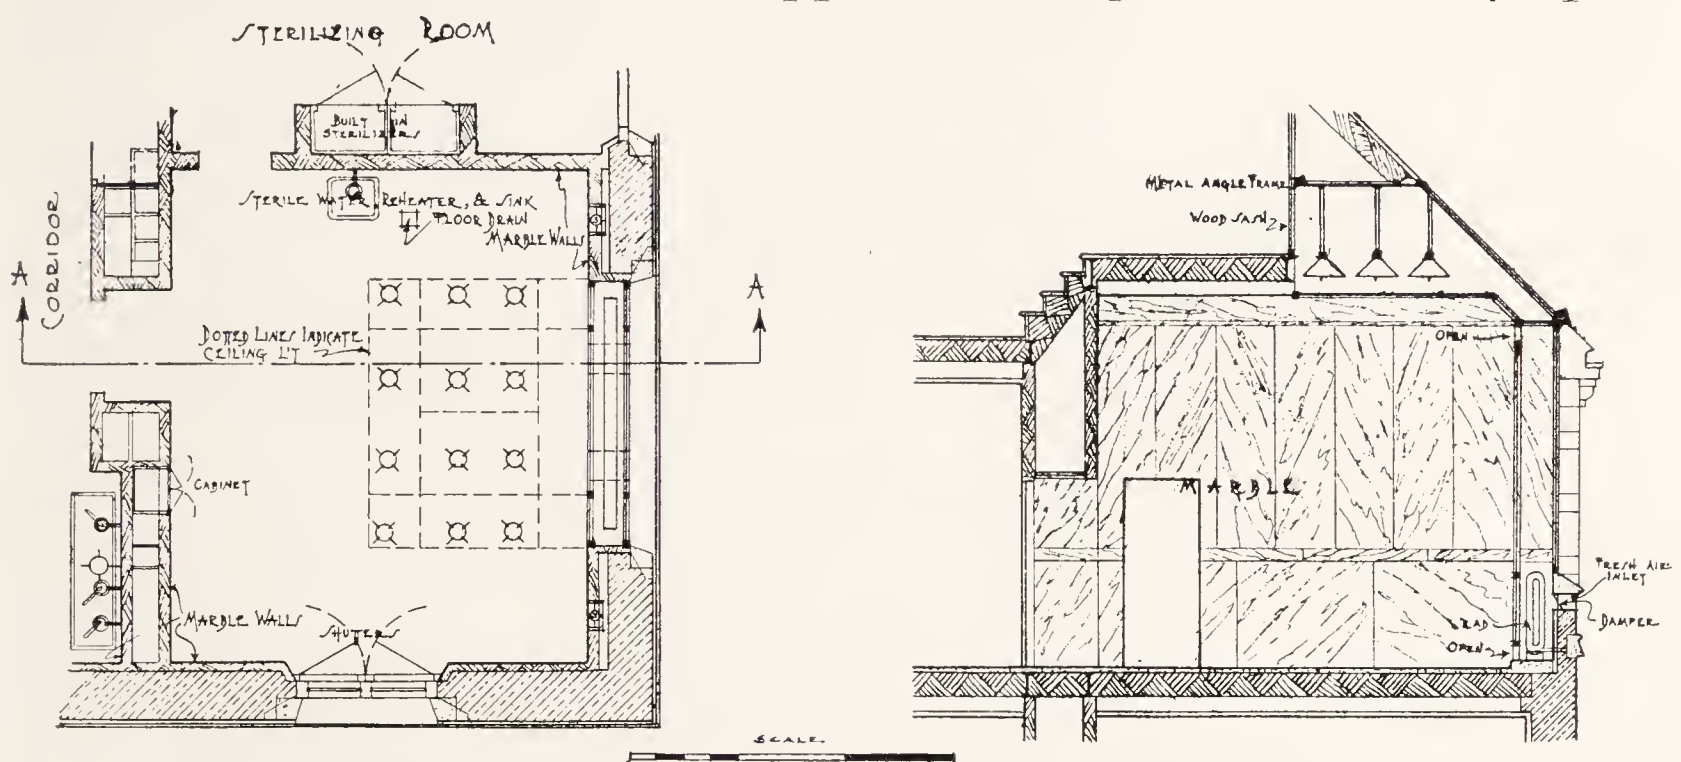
HOSPITAL SCHOOL AT CANTON, MASS., SHOWING ROOF VENTILATION
